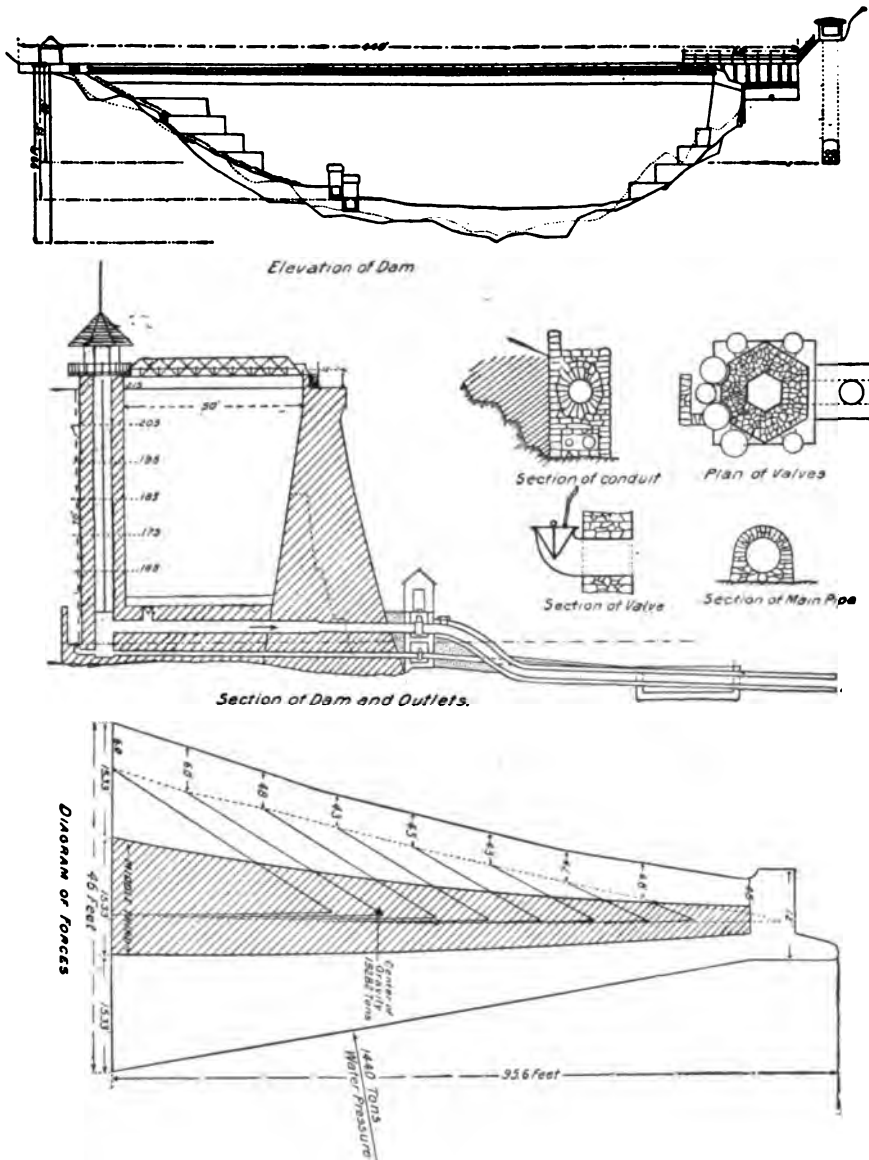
ELEVATION AND SECTIONS OF SWEETWATER DAM.
